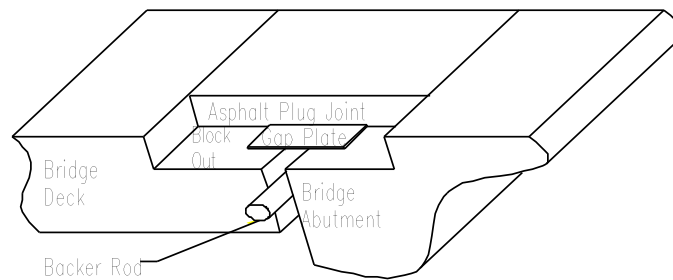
Typical Asphalt Plug Joint Cross Section
